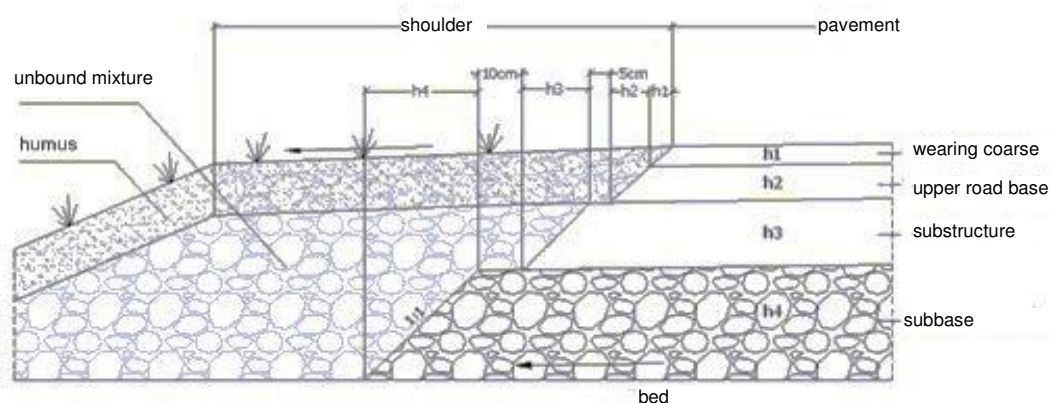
Completion of asphalt courses installed in pavement structures
